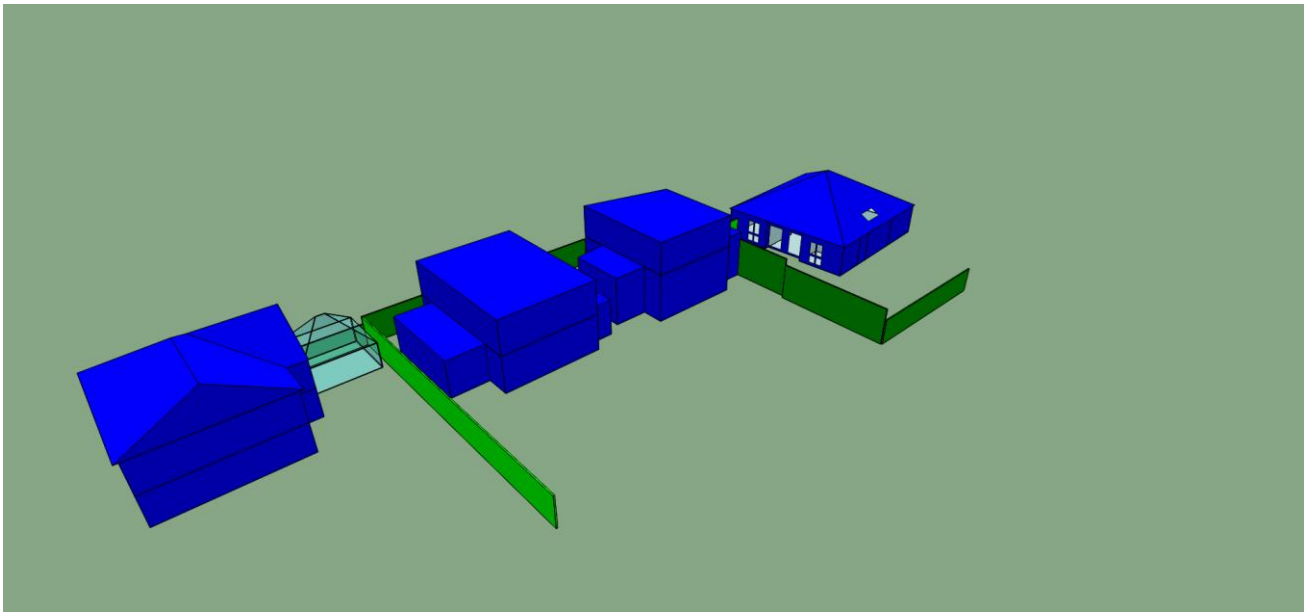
Birds-eye view of the proposed development and surrounding buildings
